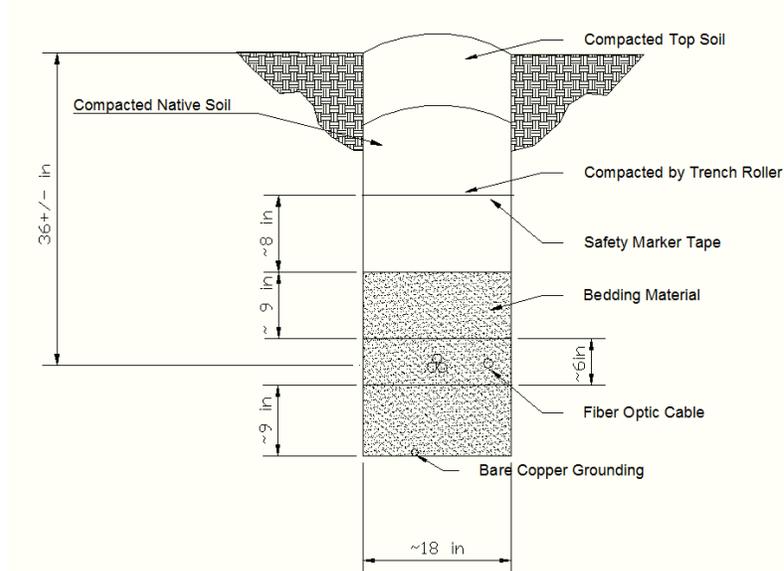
Underground Collection Cable Installation, Typical
